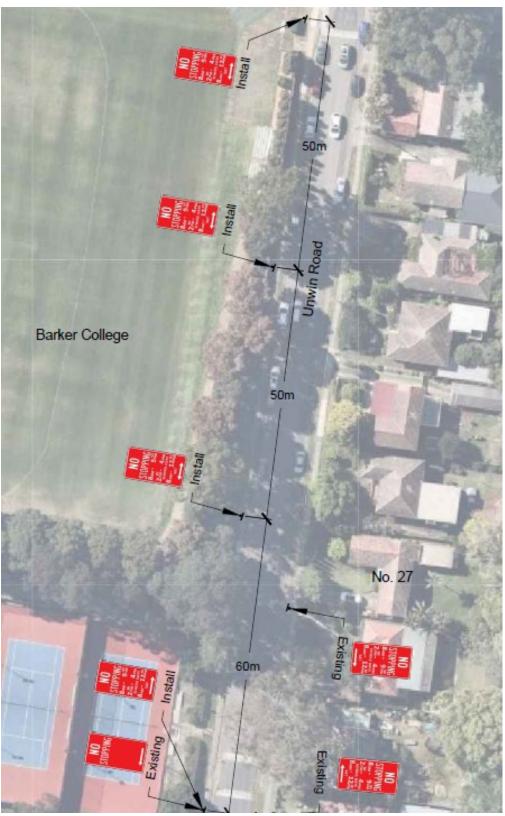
Council Parking Restrictions along Unwin Road (Plan 2)
